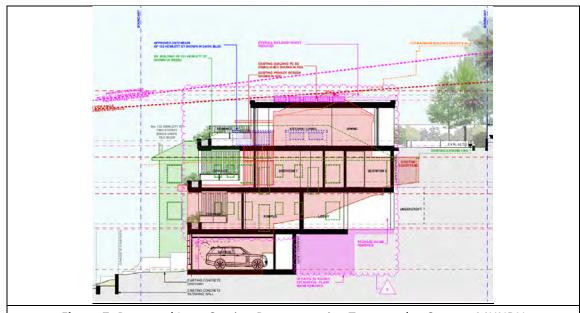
Proposed Long Section Demonstrating Topography, Source: MHNDU
